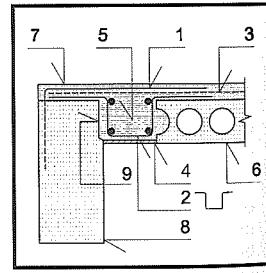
In-Situ Strip In Hollow Core Slab With Beam
